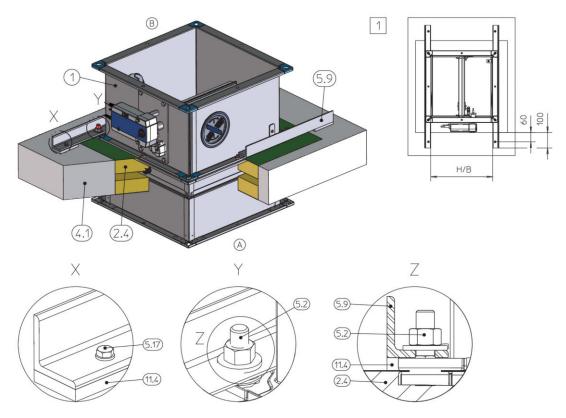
Suspension of FK-EU when a fire batt is used above (detail X) or below (detail Y) the damper
